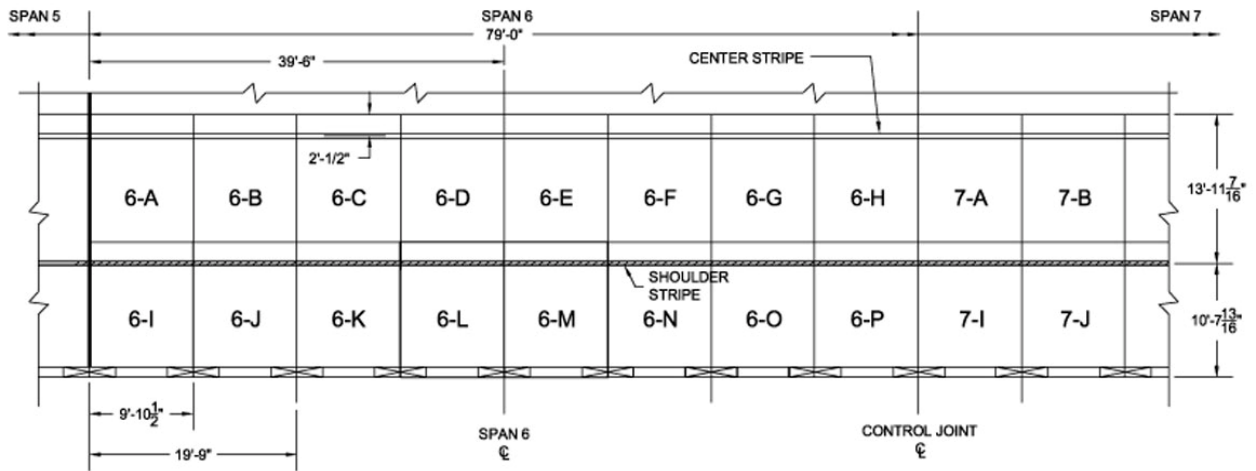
Labeling of the Deck in Spans 6 and 7 for Crack Mapping
